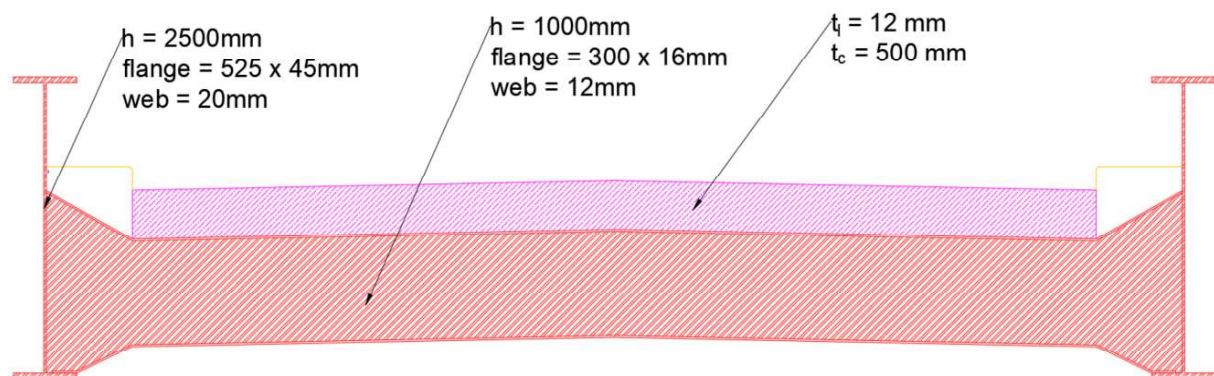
, Cross section MS variant 1, steel main- and crossbeam with FRP deck.
